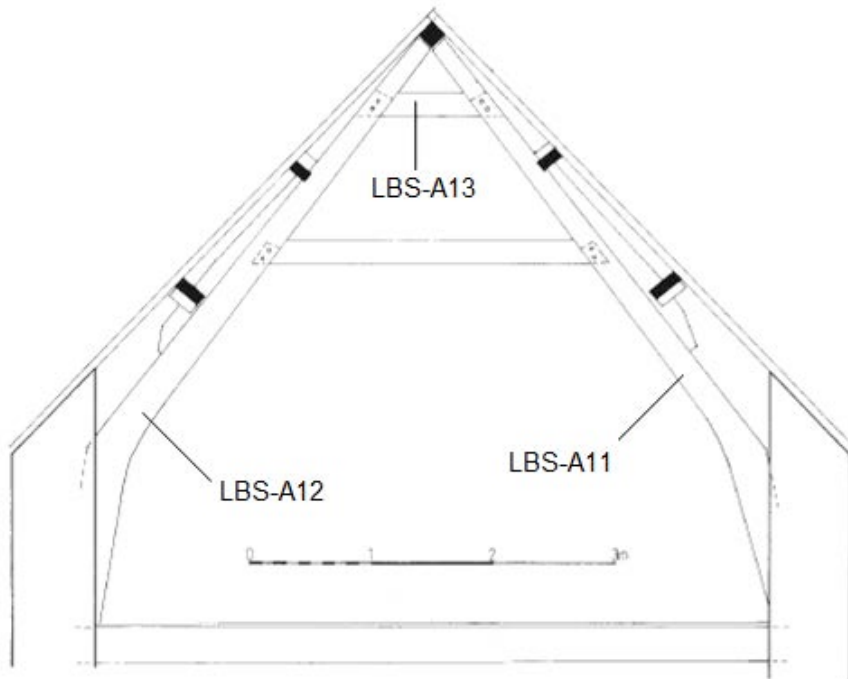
East range; truss 3 (east face), showing the location of samples LBS-A11–13 (Martin Roberts)
